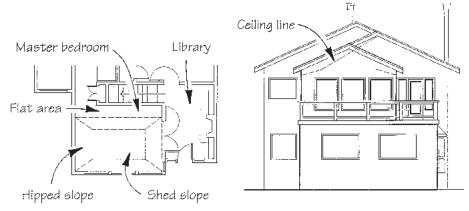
Enlarging this bedroom with a true vaulted ceiling — one that followed the complex intersecting roof planes — would have created a chaotic, unrestful space. The author designed instead a simpler, more orderly reflected ceiling bay that reinforces the room's main axis.
